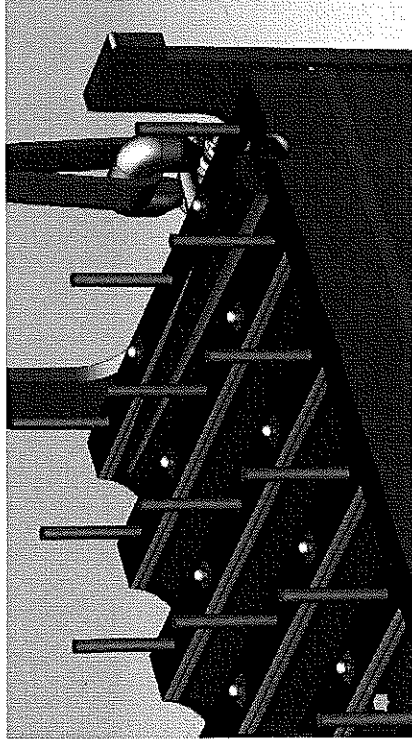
RENDER OF THE MOLD SHOWING THE CONICAL INSERT INSTALLED IN THE MOLD, NOTE FORM #1 REMOVED FOR CLARITY.
